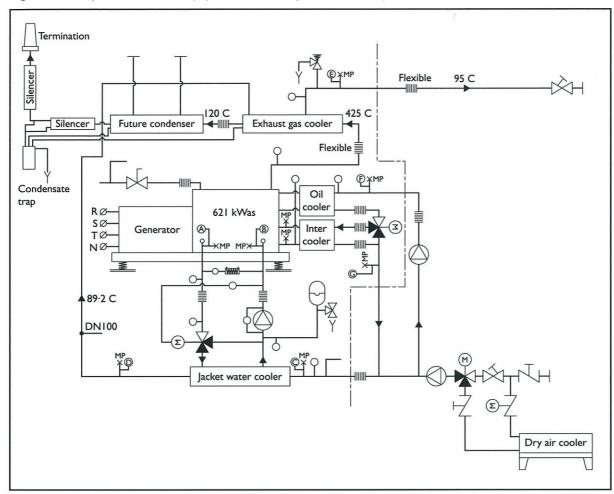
Example of a heat recovery system for CHP engine linked to a dry air-cooler.
